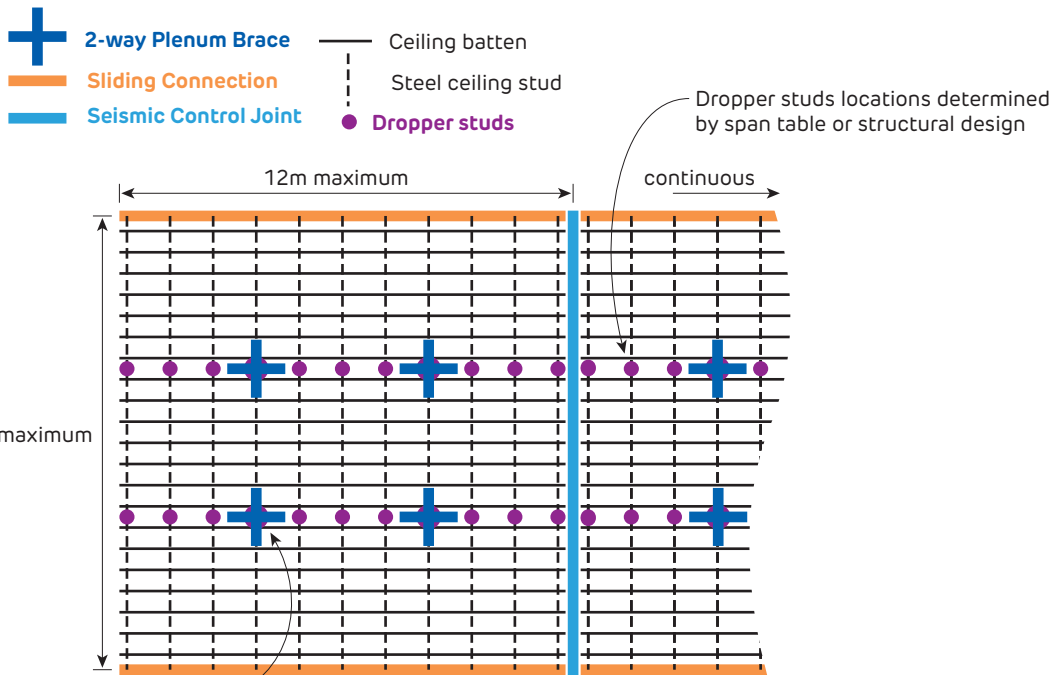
Stud Ceiling Type C2 - 2-way Plenum Braced
